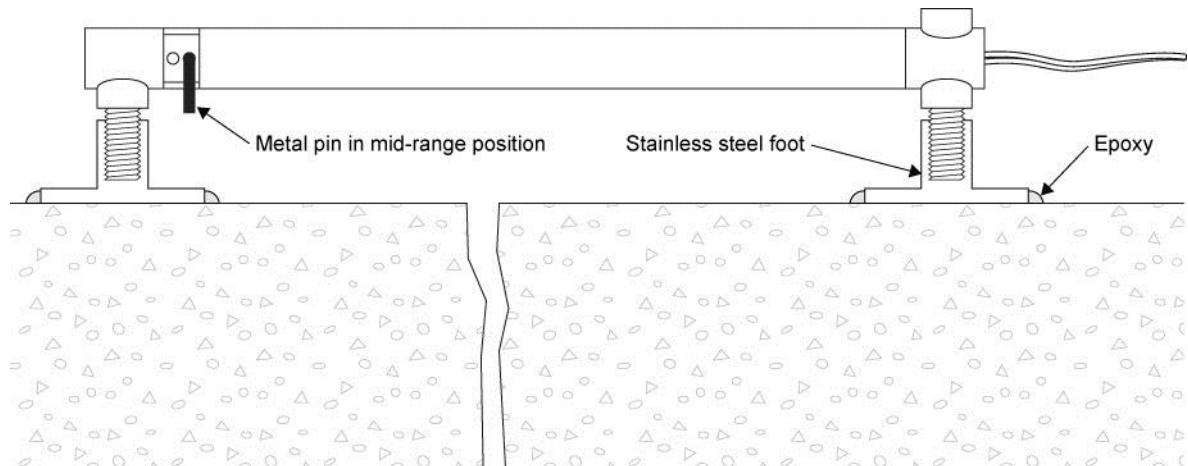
Model 4422-2 Monument Crackmeter, Surface Mounting Type
